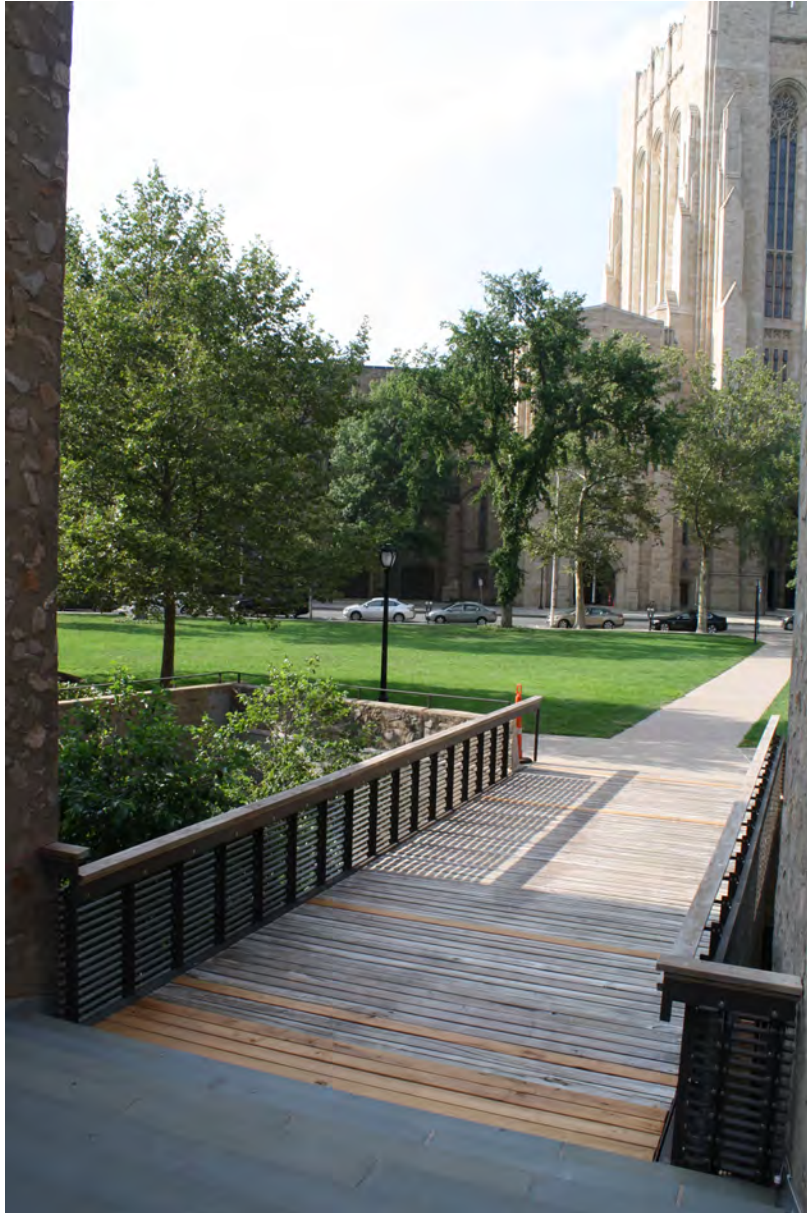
View of the new pedestrian bridge facing Tower Parkway green; camera facing north.
